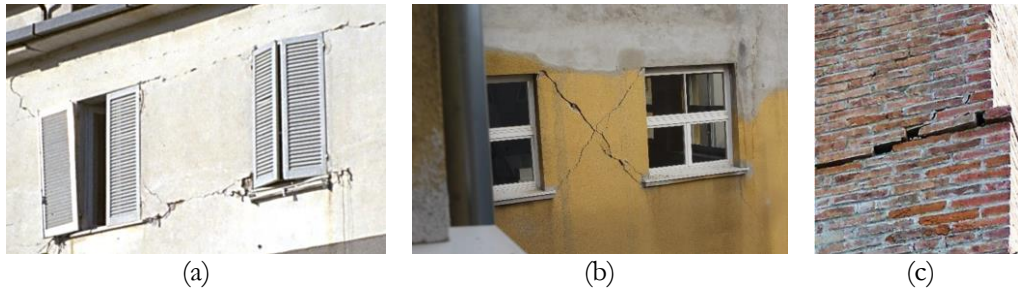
Masonry failure mechanism observations in piers: (a) flexural; (b) diagonal shear; (c) sliding shear (D'Altri *et al.*, 2019).
